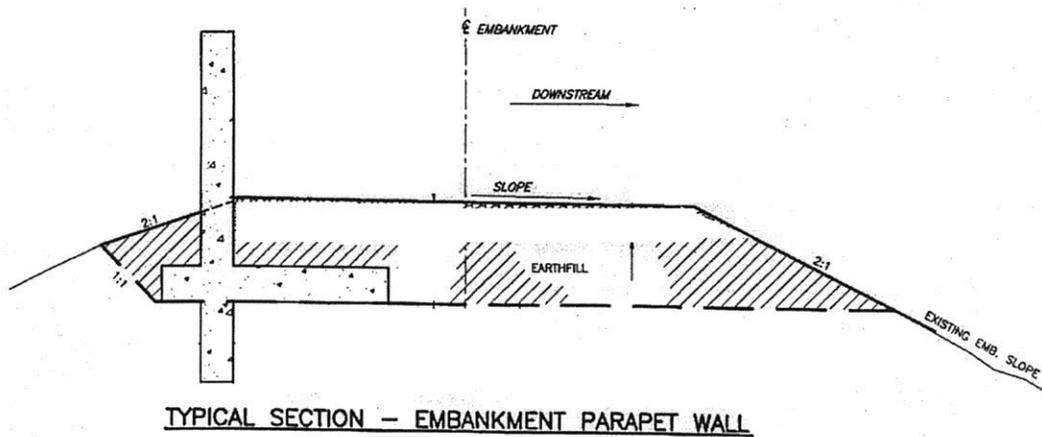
Cross-sectional view of typical parapet wall design. The wall is installed on the upstream side of the dam. Roads located on the tops of the dam will remain in their present location.
